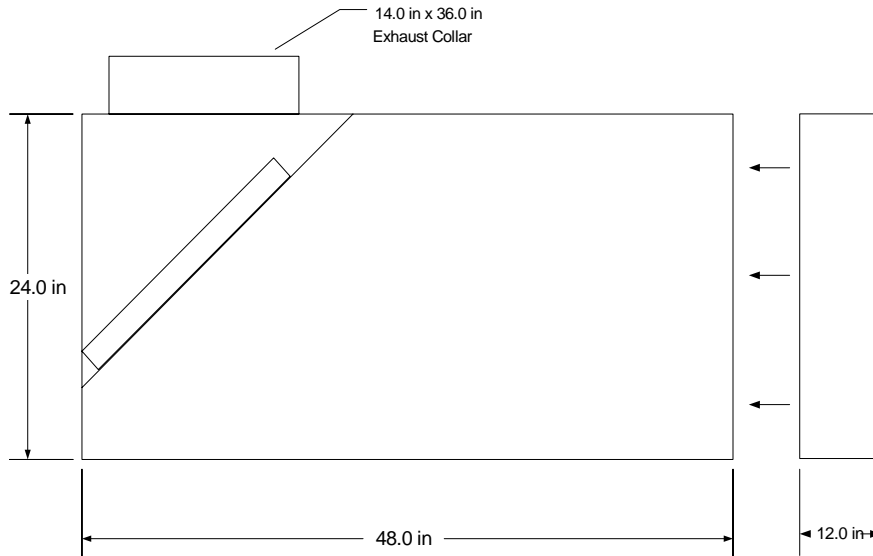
Cross Section Drawing of 1 foot Hood Depth Modification
